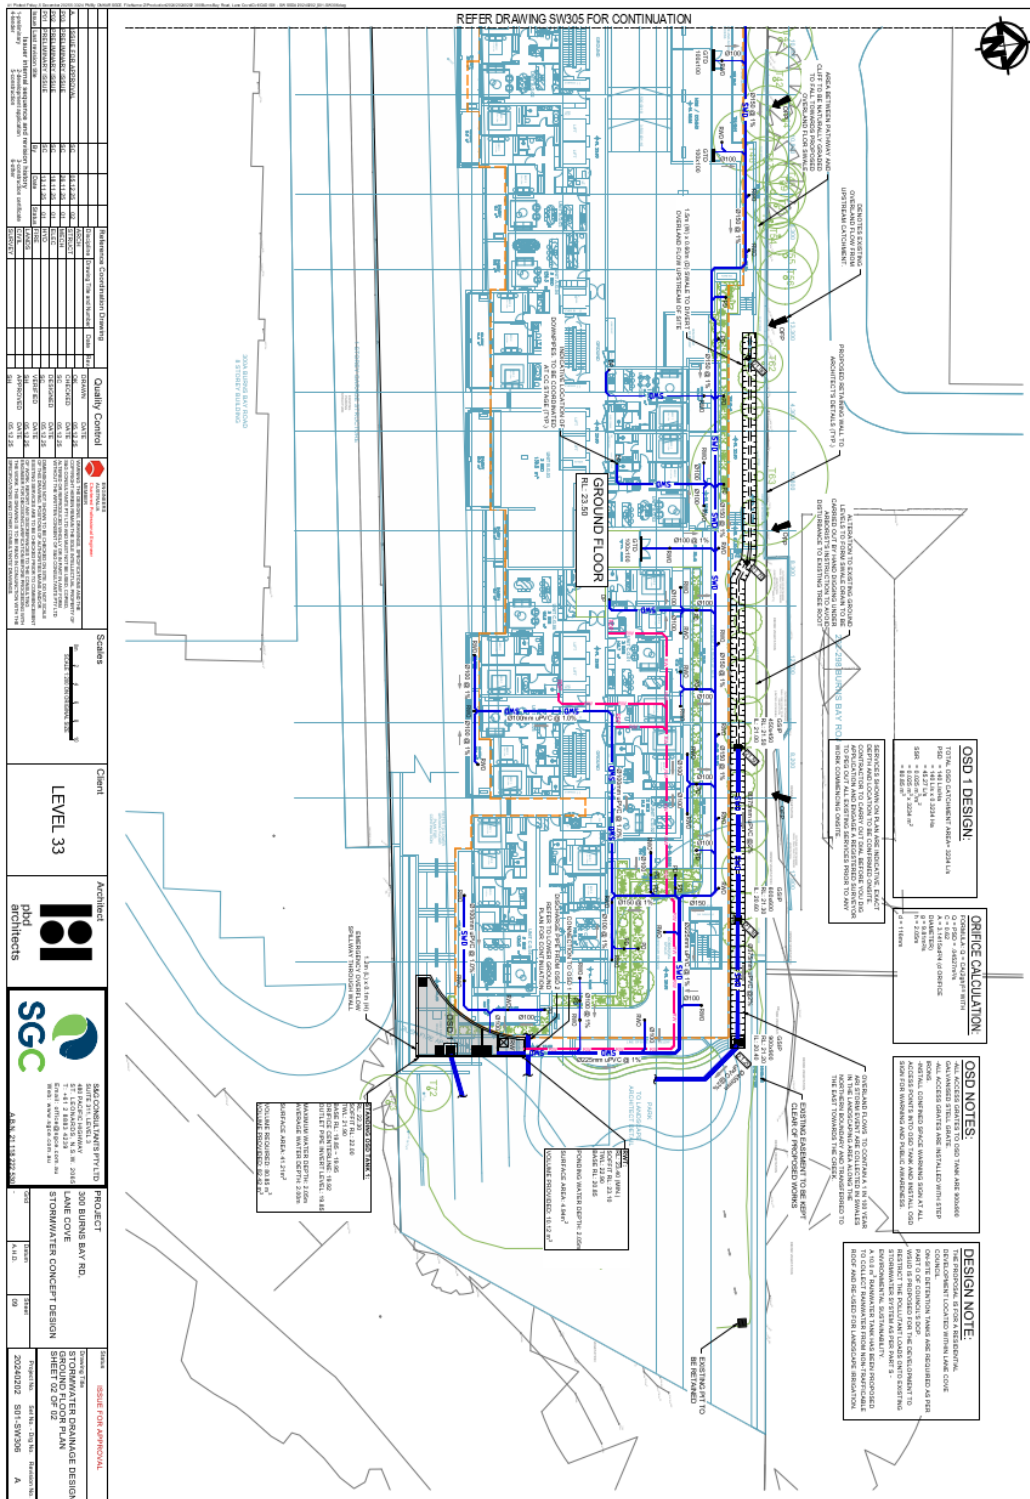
Stormwater Plan – Ground Floor – Sheet 2
